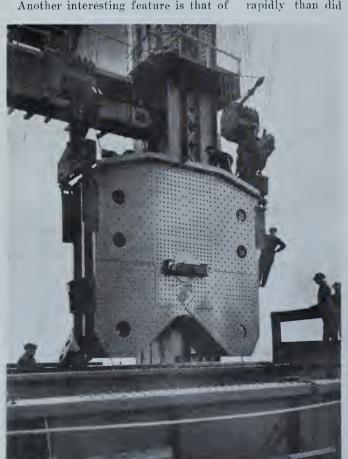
MAIN POST CAP AND CHORD CONNECTION BEING HOISTED INTO PLACE
